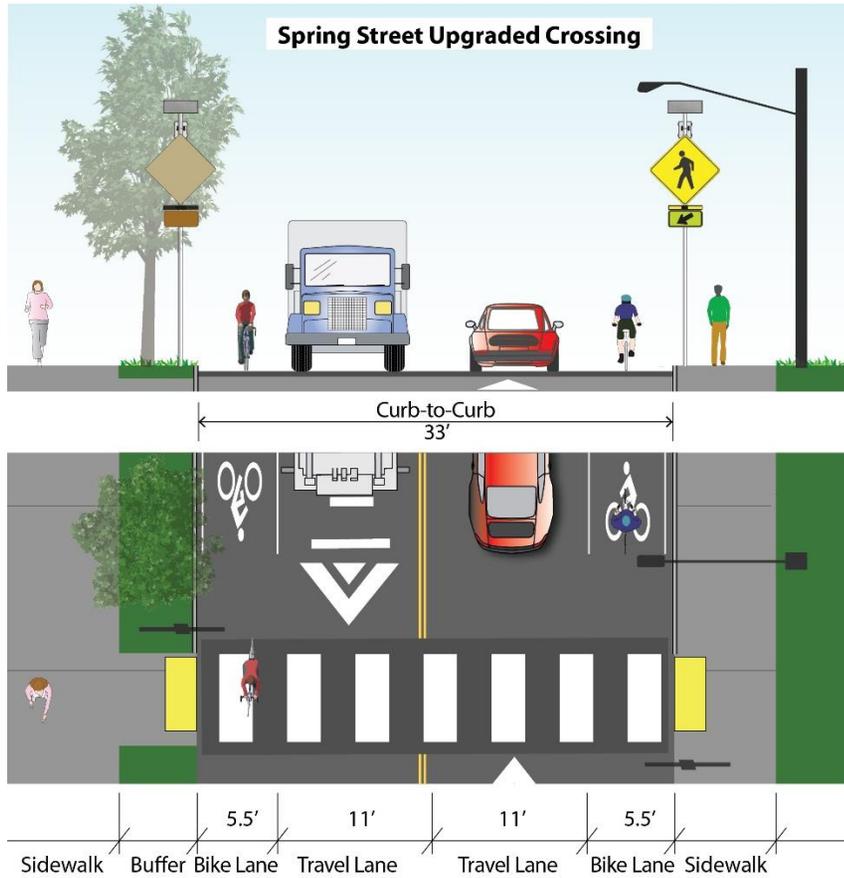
Preferred Alternative — Upgraded Raised Crossing at Broadway and Spring Street (Section View)
